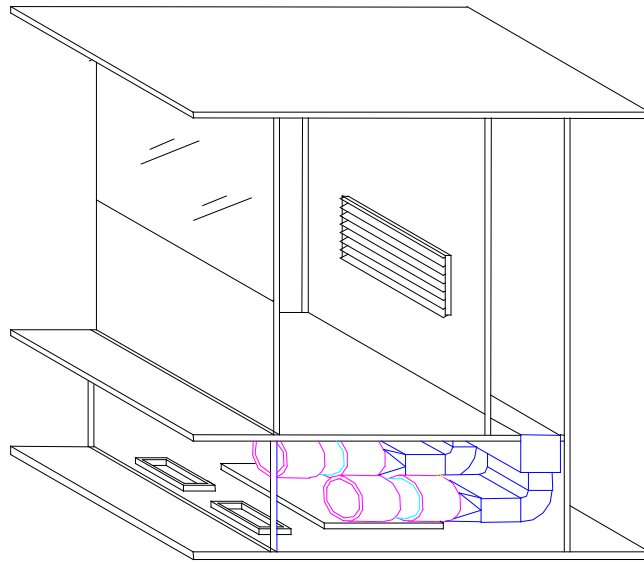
shows the isometric elevation of the plant room, the external louver and the walkway. From the figure, it is noted that the plant room contains two sets of mechanical ventilation fans mounted on the slab. These ventilation fans are then coupled to a common exhaust air plenum box before it is being exhausted out to the walkway through the louver located on the wall next to the building side entrance. The details of the various components are clearly shown in Figure 3.3 and Table 3.1.
